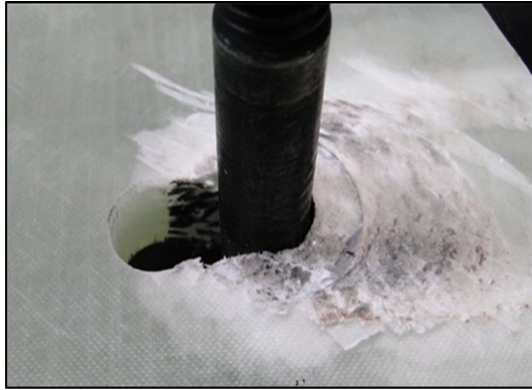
Bearing failure of close fit non-threaded joint
